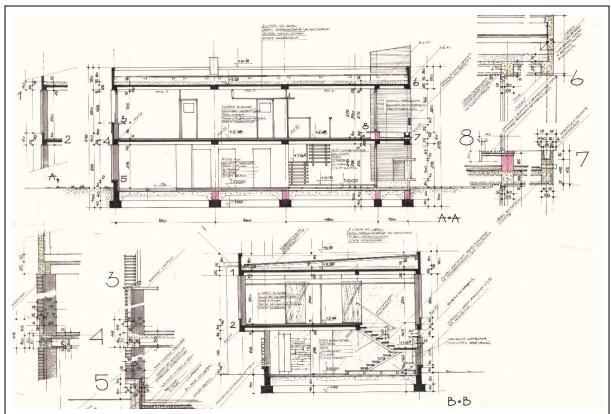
Cross-sections of the house, J. Jarecki, 1969.
